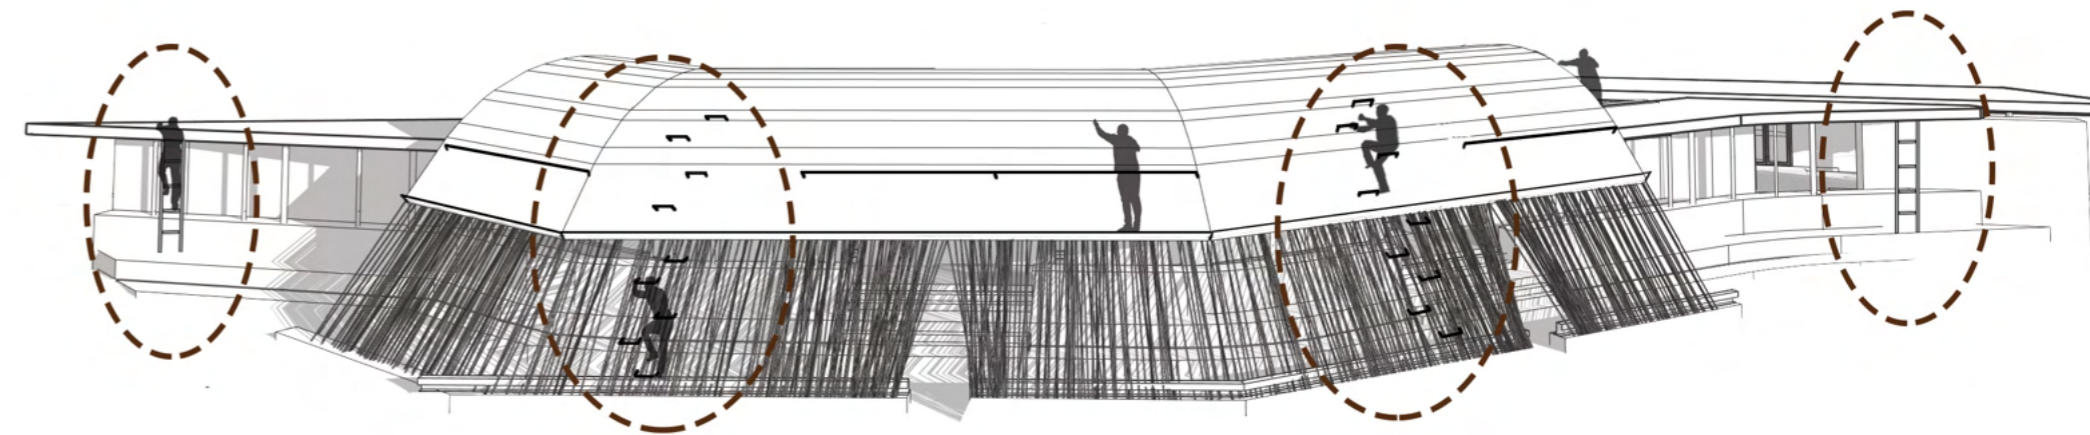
Maintenance Roof Accessibility (Author 2021)
